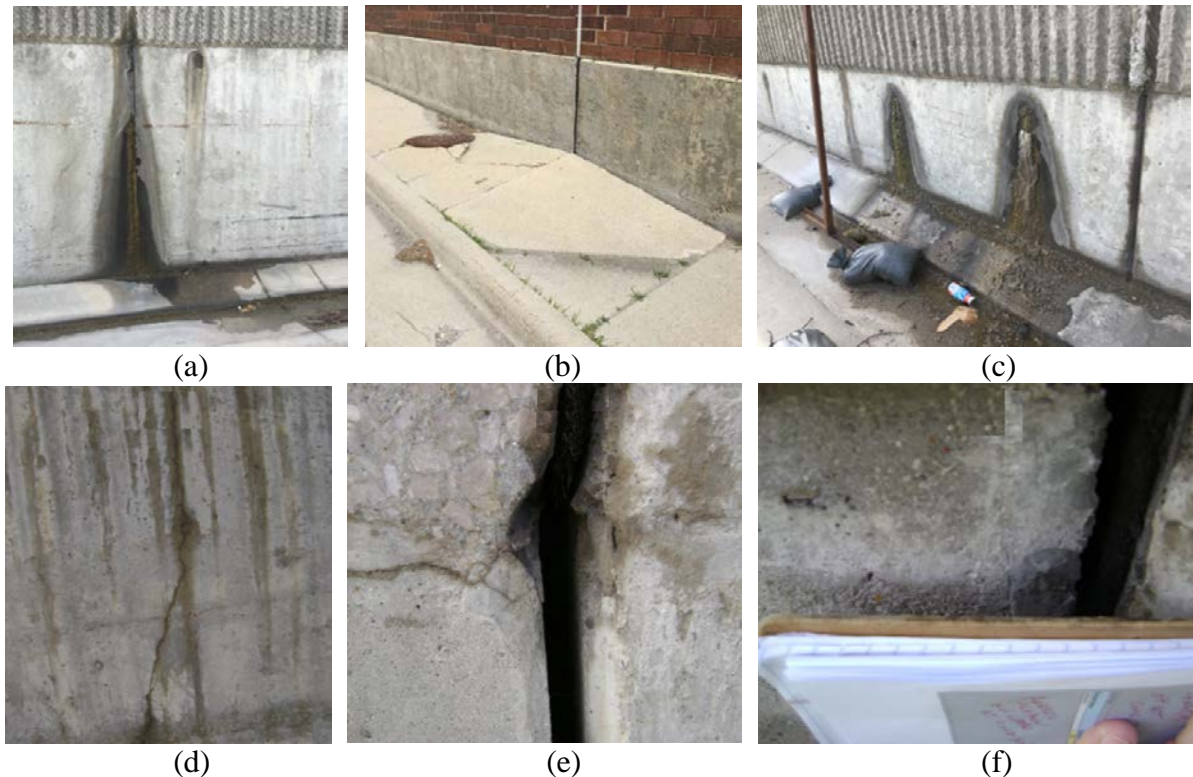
Issues observed on I-696 wall panels (June 2017): (a) water leakage via the lower portion of the wall expansion joint; (b) walkway failure on the top of the wall back fill; (c) prolonged and severe weeping through drainage holes; (d) moderate levels of vertical cracking; (e) excessive wall expansion at panel joints; (f) differential tilt of adjacent panels.
